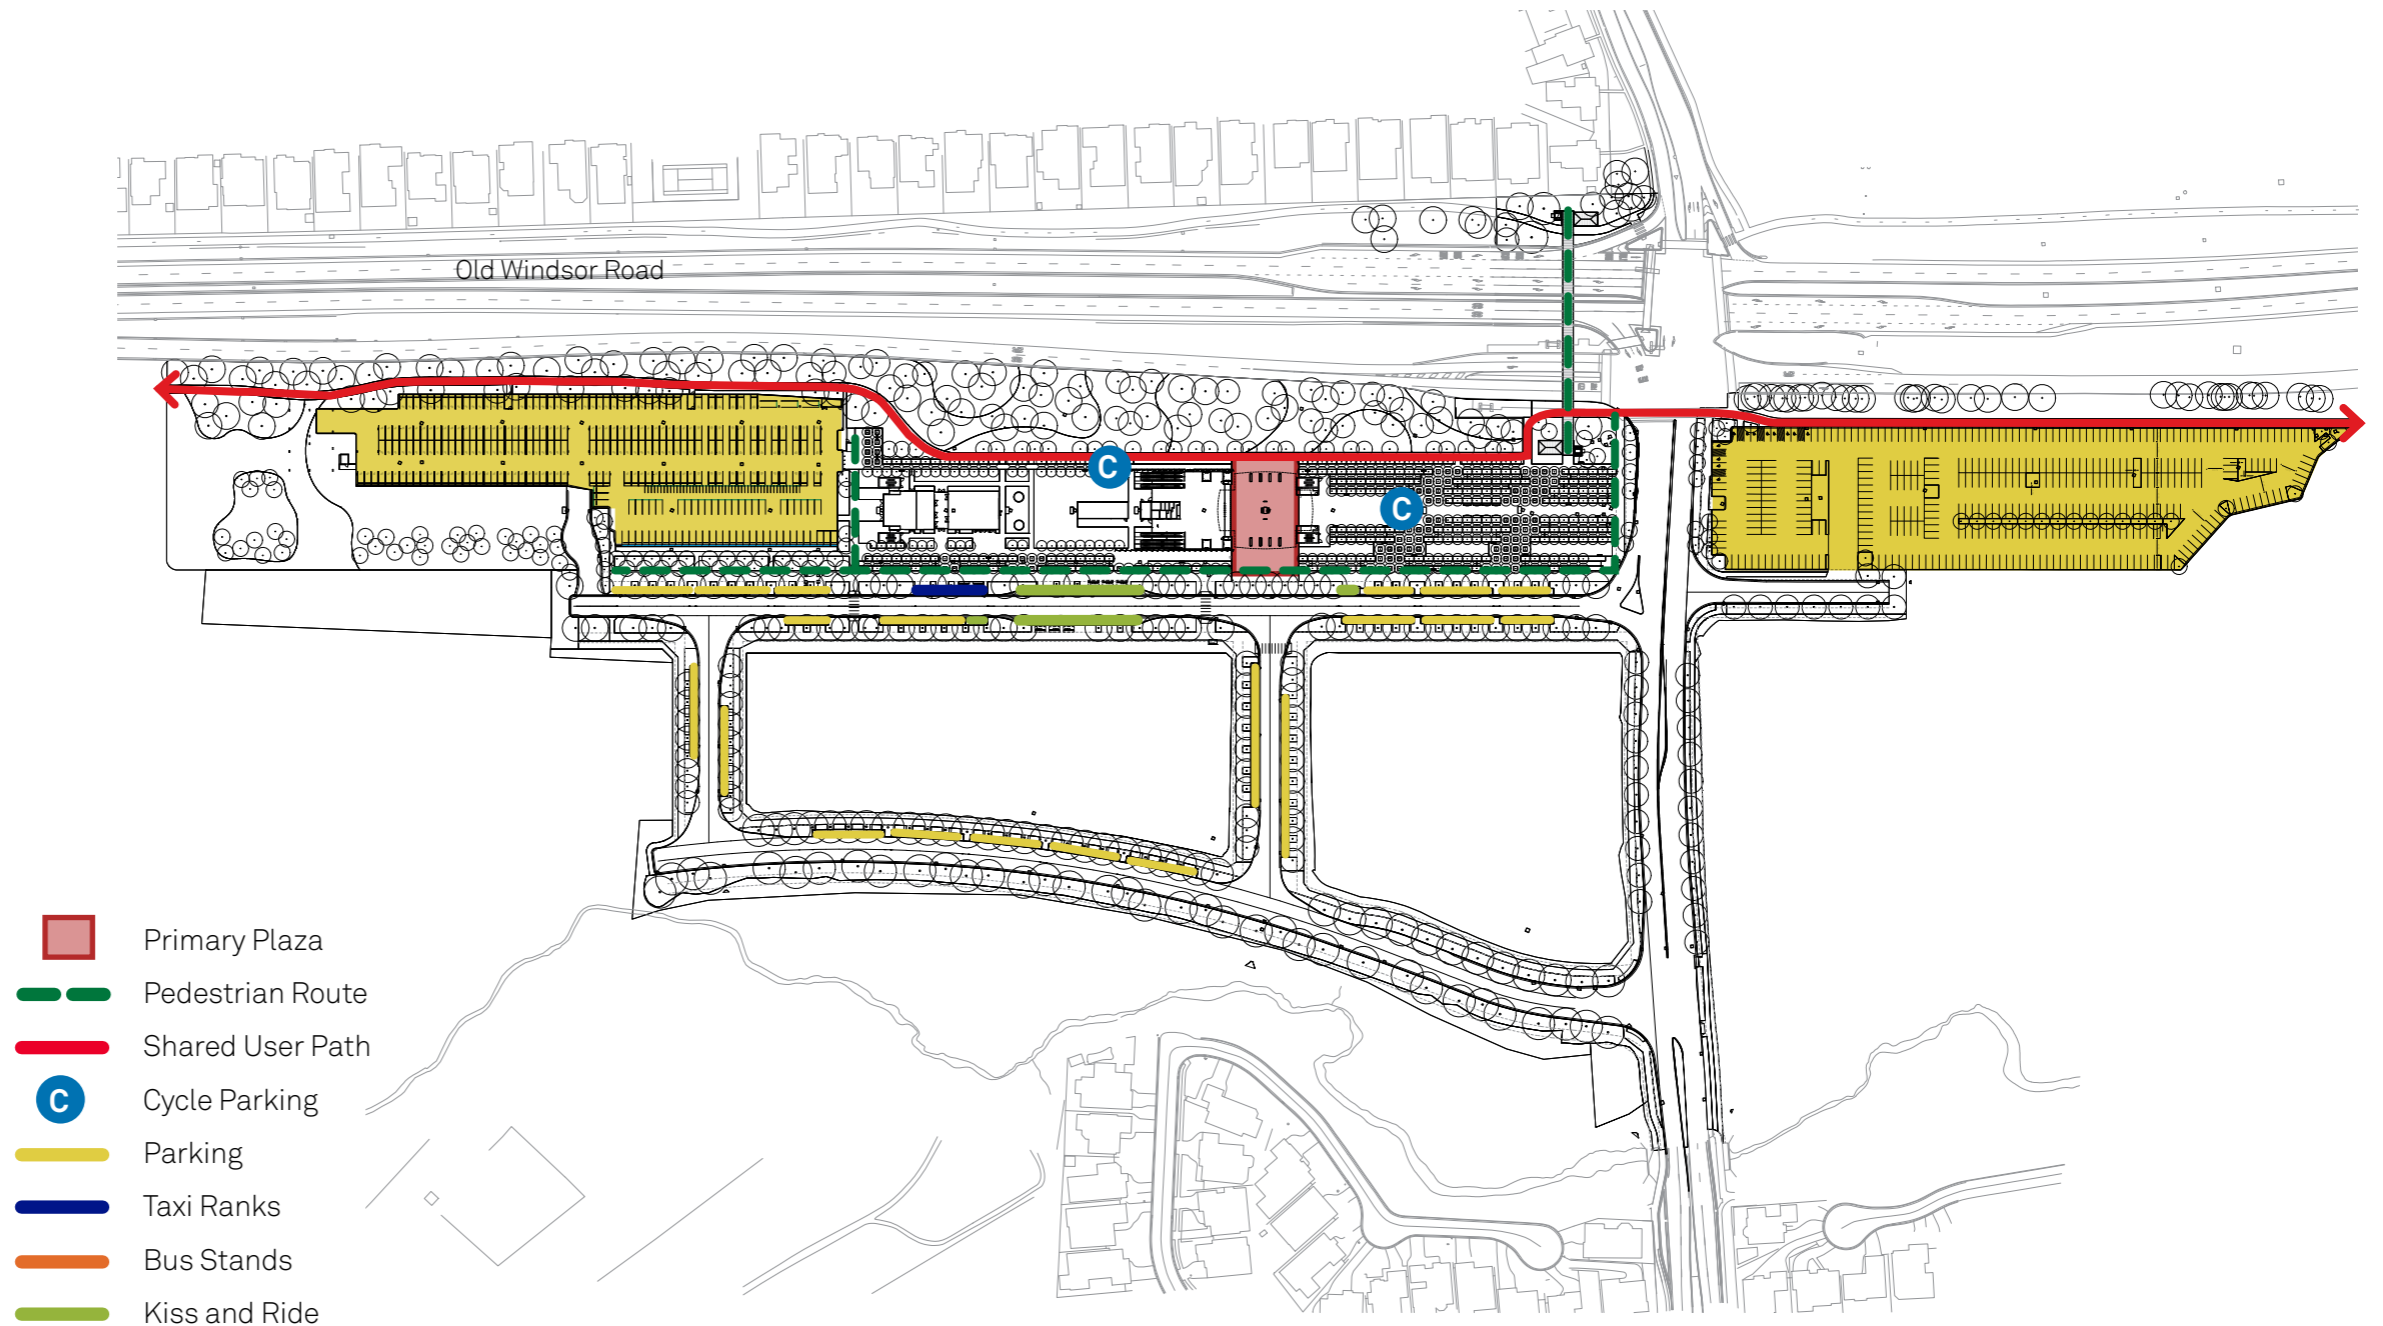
KVE\_Kellyville Station Plan showing Parking, Pedestrian, Cyclist Access Arrangements and Facilities. Source: HASSELL.
